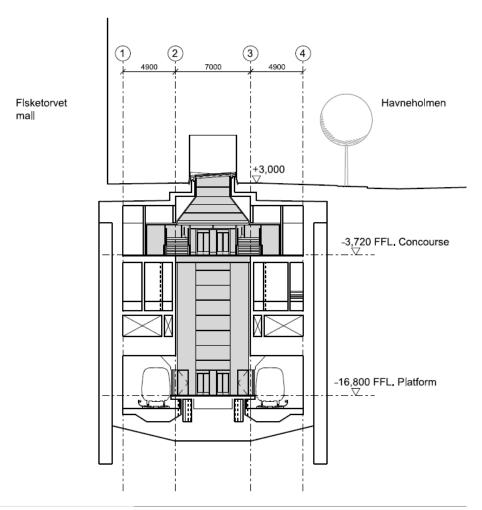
Fisketorvet, deep underground station, Typical Cross section
